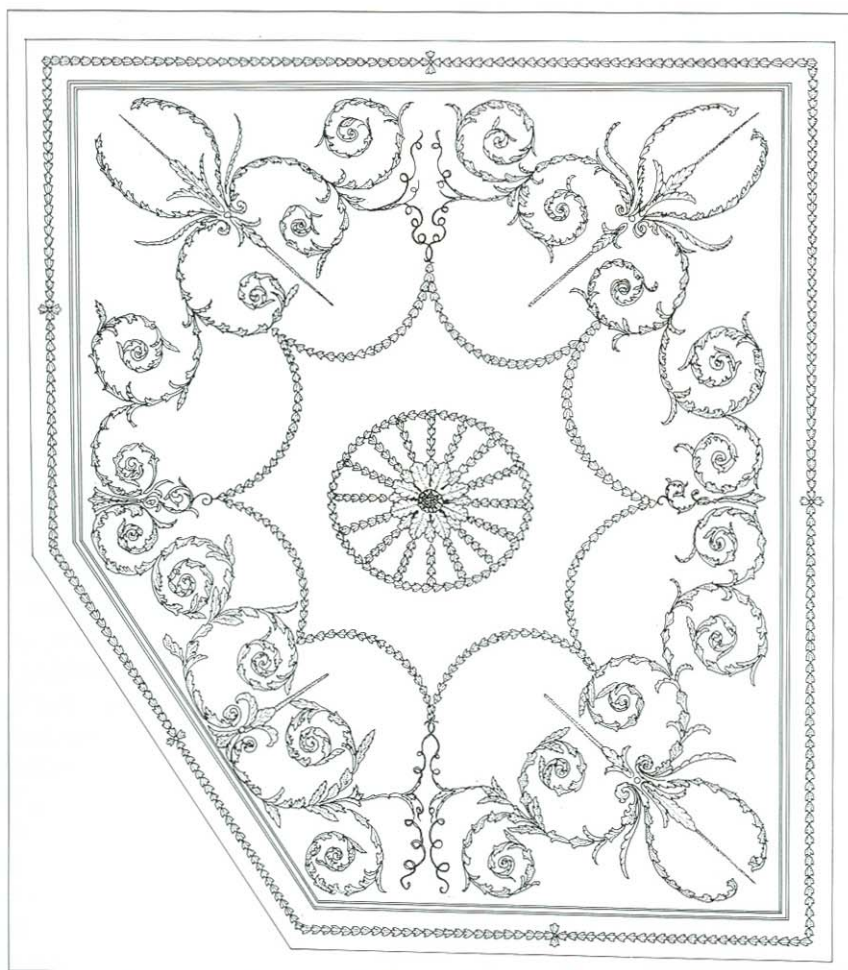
Reflected ceiling plan for the small dining room. This drawing was used to document the consolidation of the dining room's plaster ceiling. Illustrations prepared by John G. Waite Associates, unless otherwise noted.
